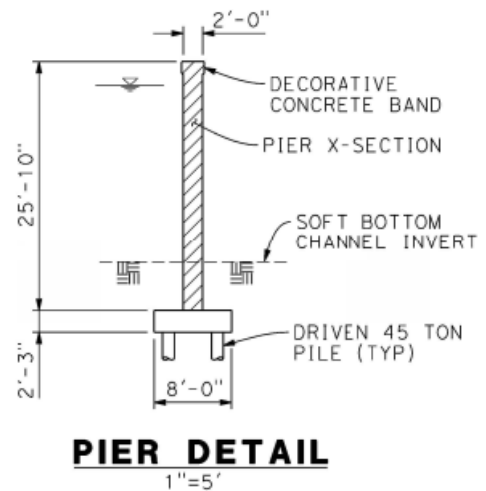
Pier Detail, Proposed Lincoln Boulevard Bridge over the Ballona Creek
